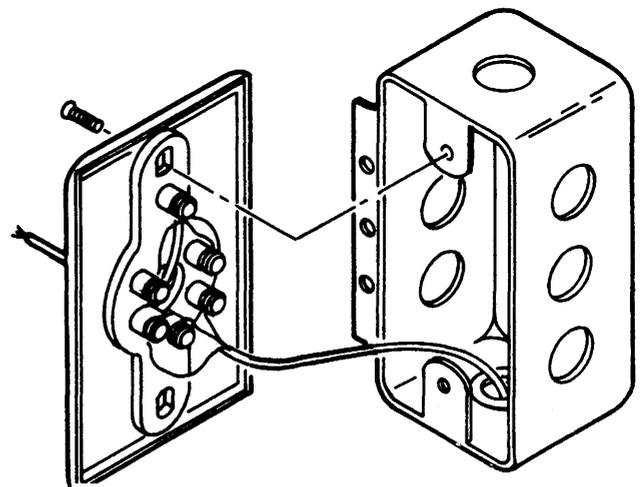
Installing Model 1105 Connecting Block in a Conduit Box.
